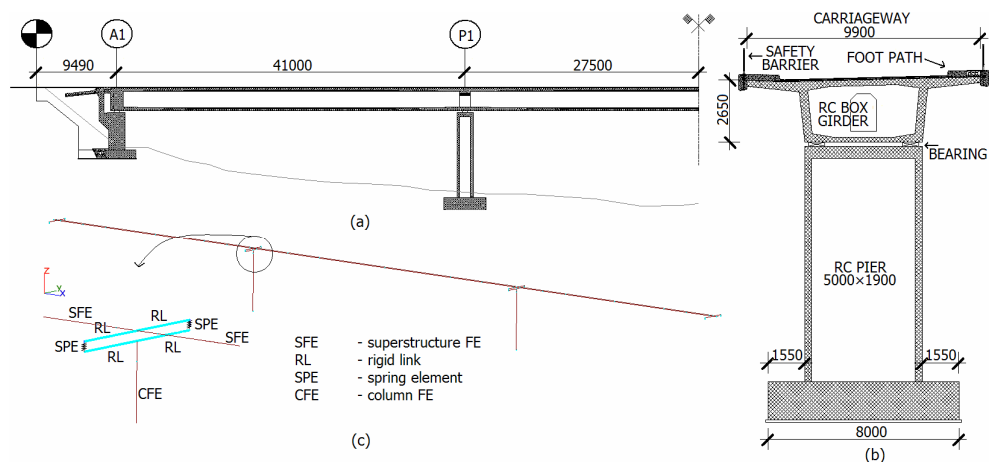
(a) elevation, (b) cross section of bridge (c) bar model
